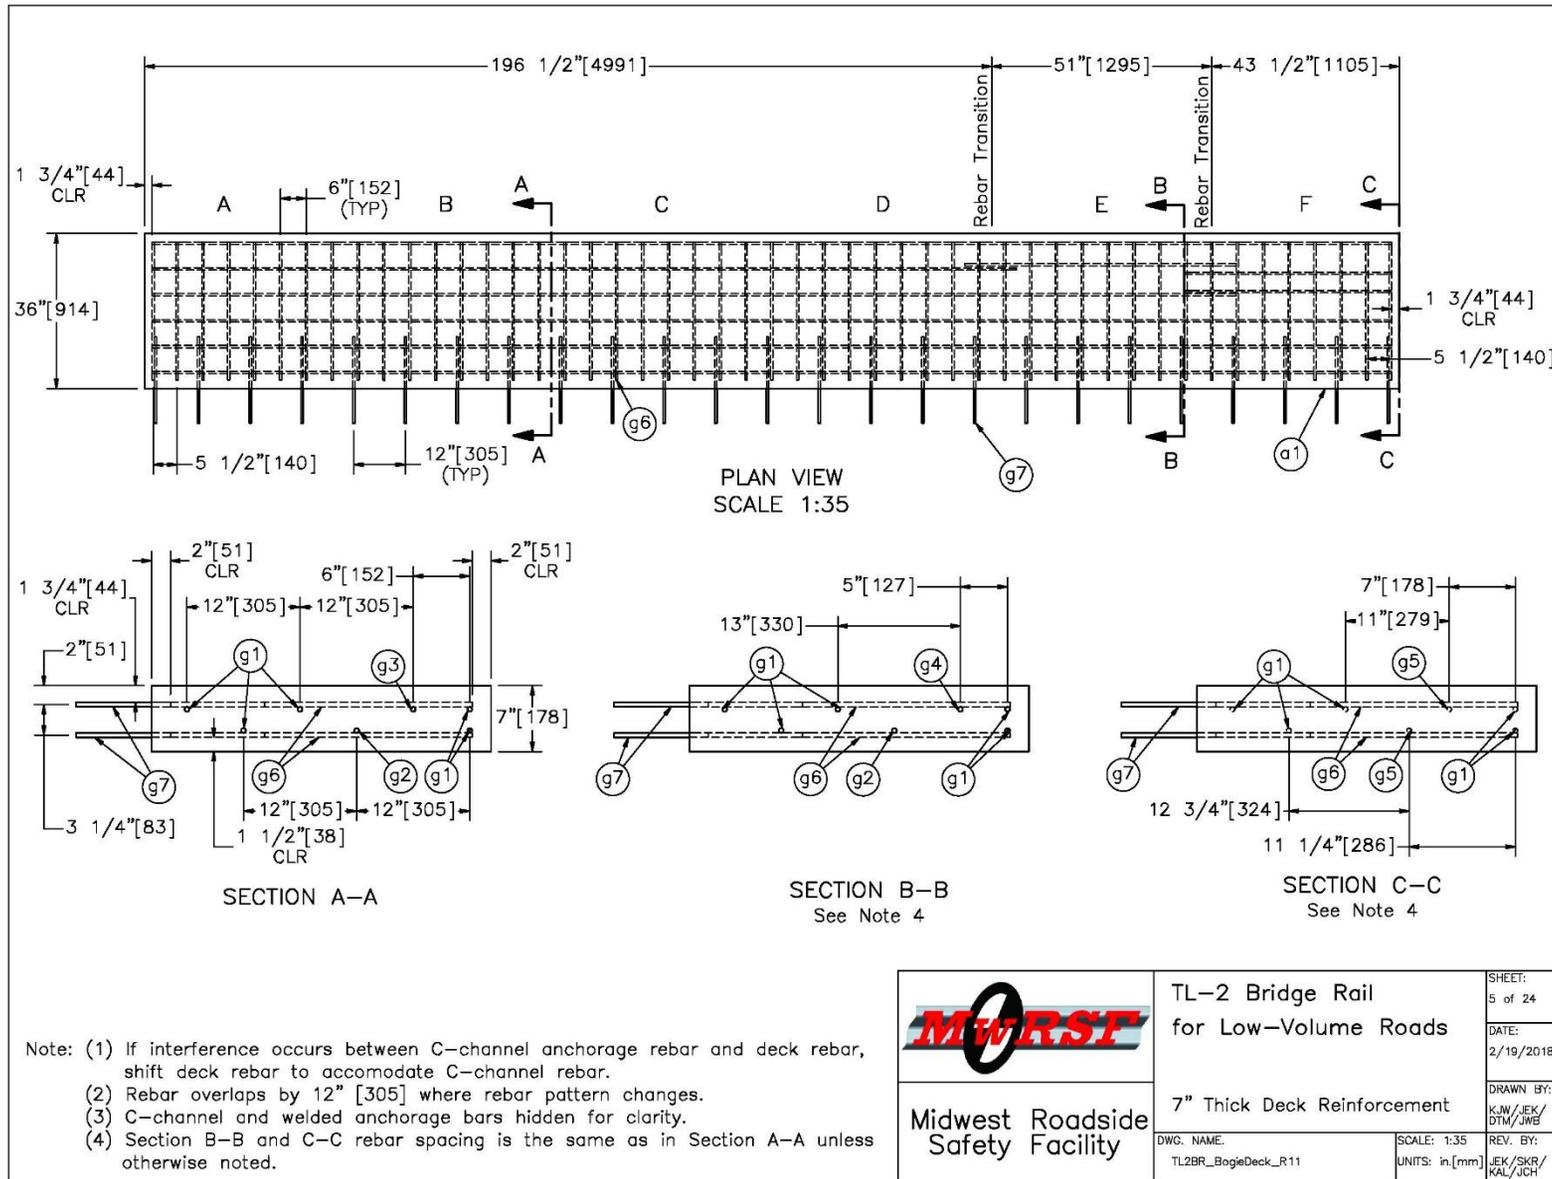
Bogie Testing Matrix and Setup, 7-in. Thick Deck Reinforcement
